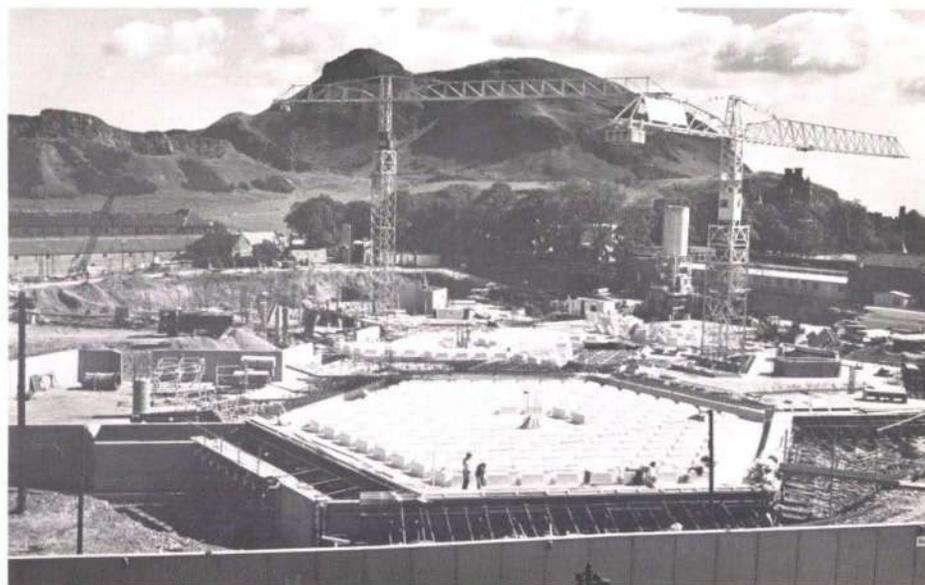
Coffered floor modules under construction (Photo: A. L. Hunter)
